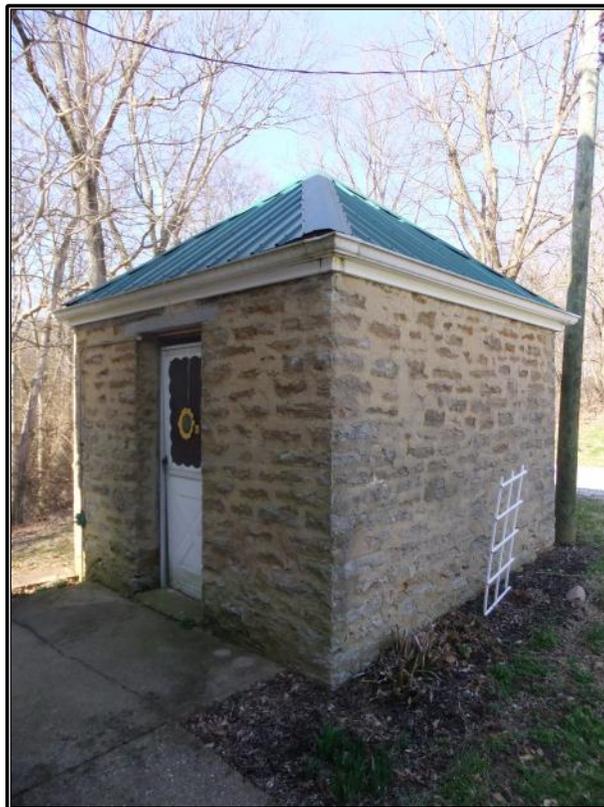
Site 72: southeast and northeast elevations of mortared-stone smokehouse located northeast of residence.
